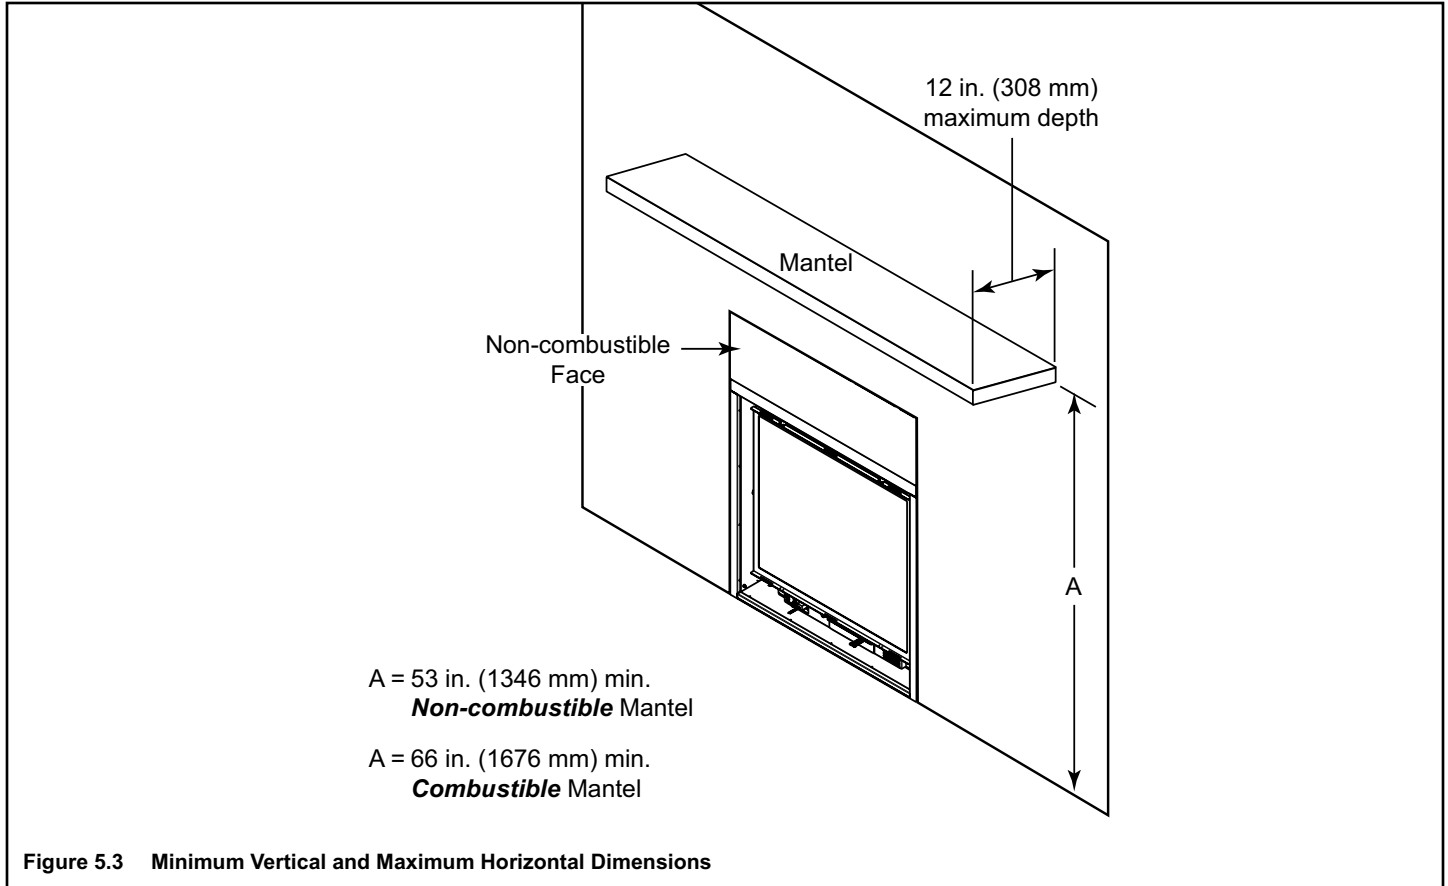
Minimum Vertical and Maximum Horizontal Dimensions
